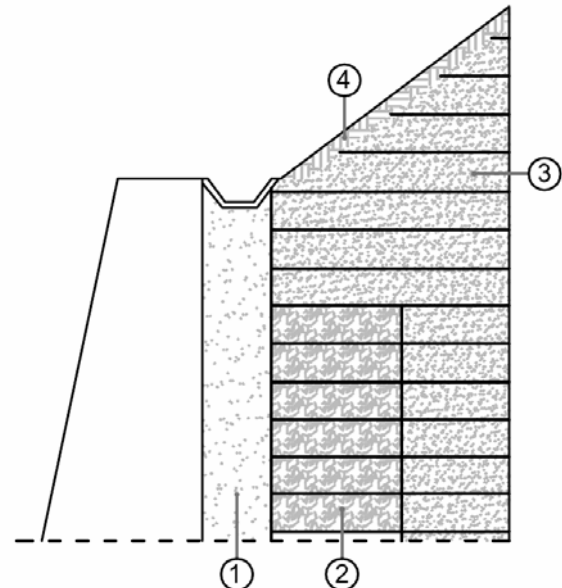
Detail of backfilling of a gravity retaining wall (1 filter, 2 uncompacted zone of approx. 1.0 m in width, 3 thoroughly compacted zone, 4 soil of low permeability)
